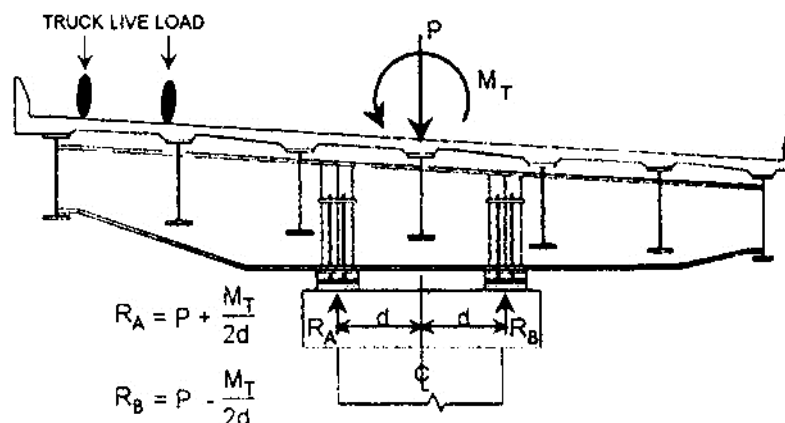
Vertical loads on bearings for an integral steel cap girder.
